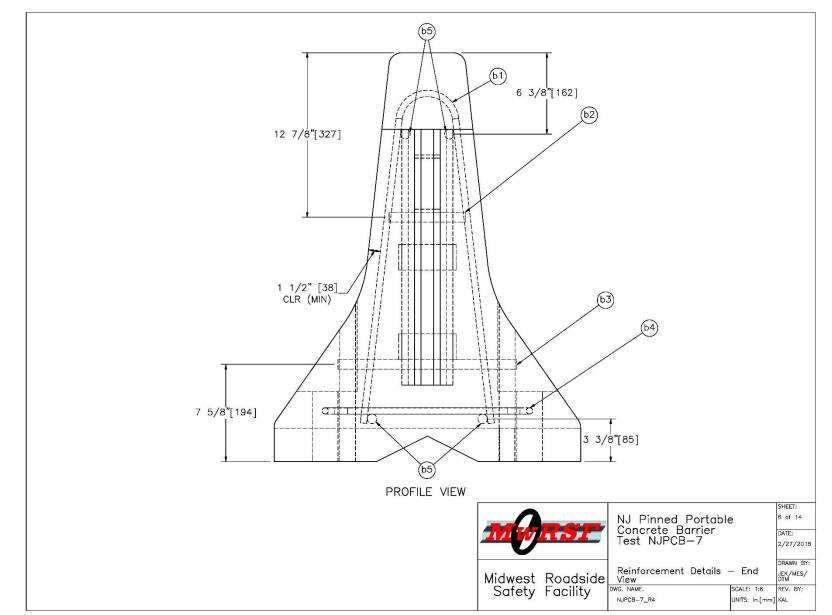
PCB Reinforcement Details – End View, Test No. NJPCB-7
